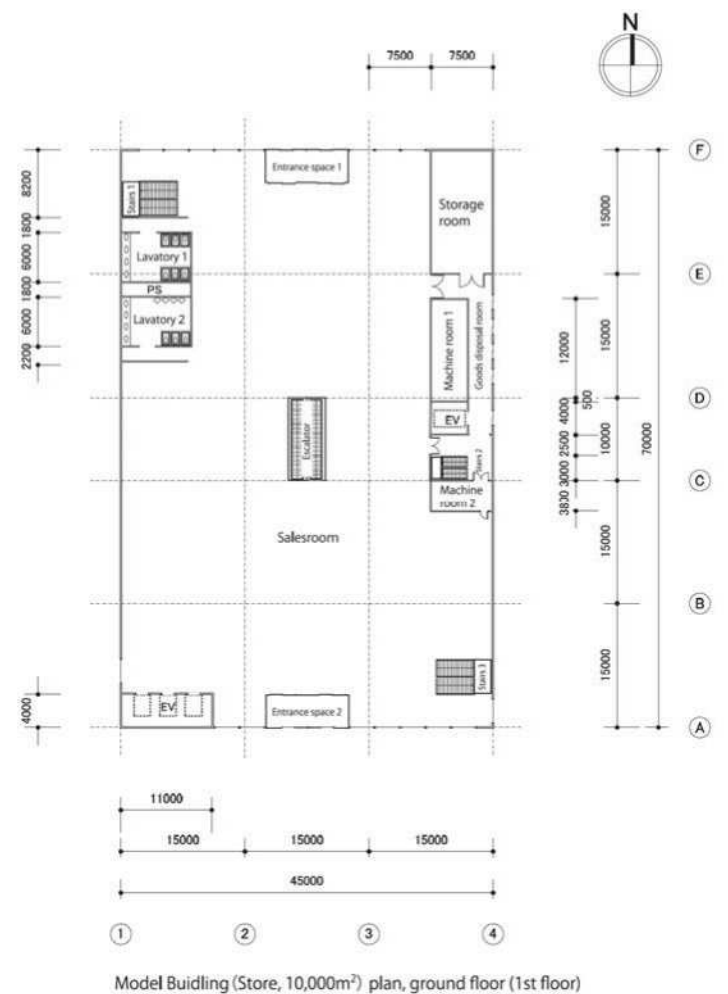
Model building (store, 10 000 m²) plan, ground floor (first floor)
